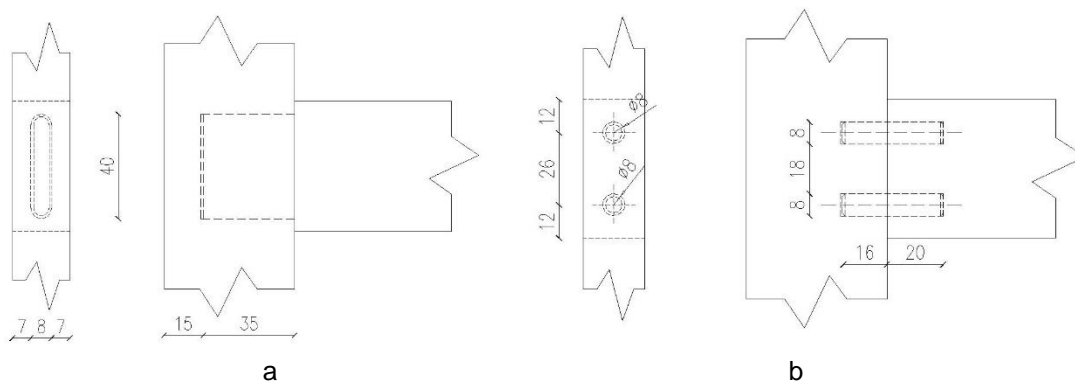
Details of the MT (a) and dowel joints (b) (dimensions in mm)
